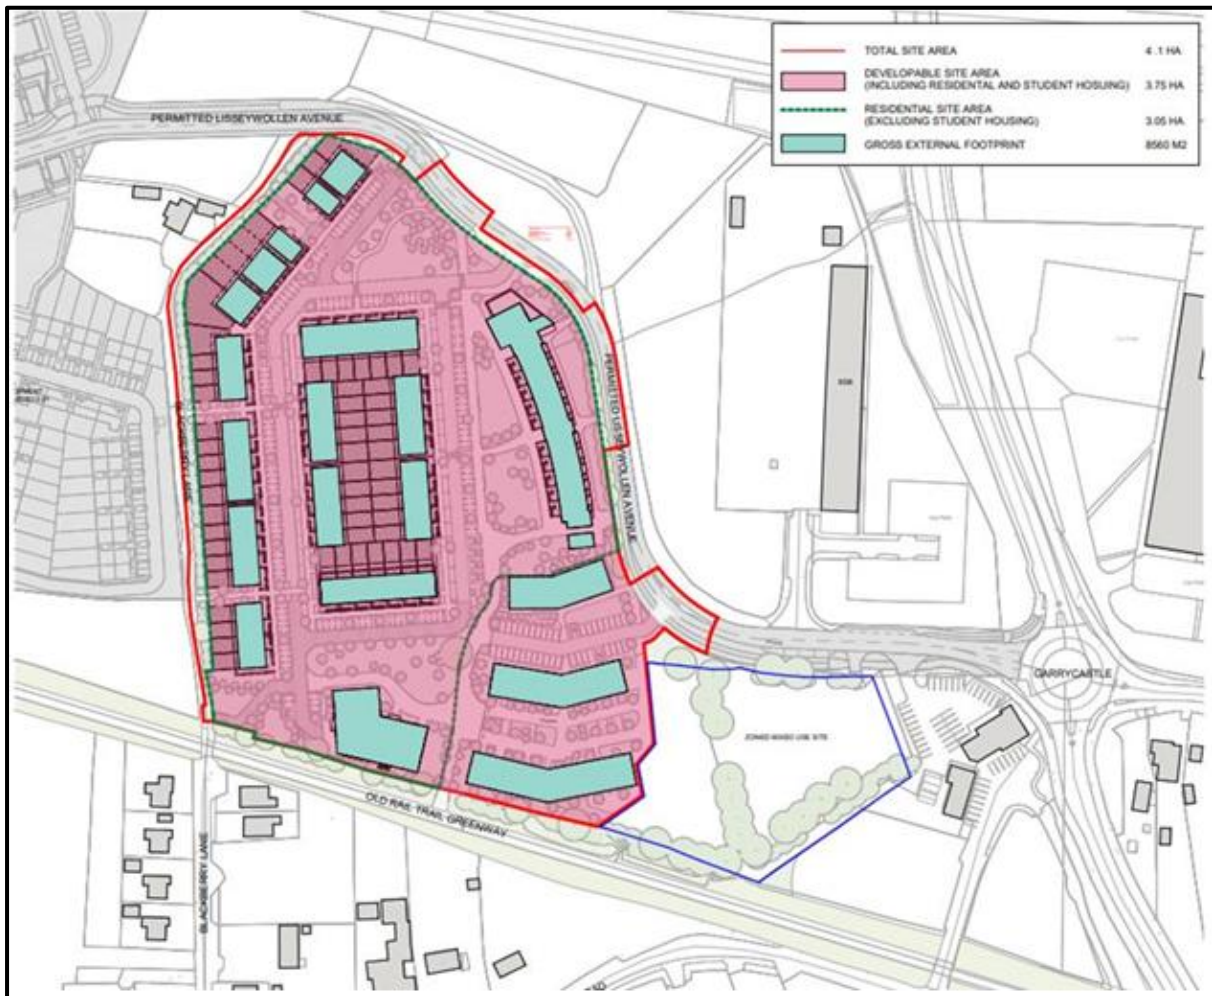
Site Layout Plan (Source: Henry J Lyons)
